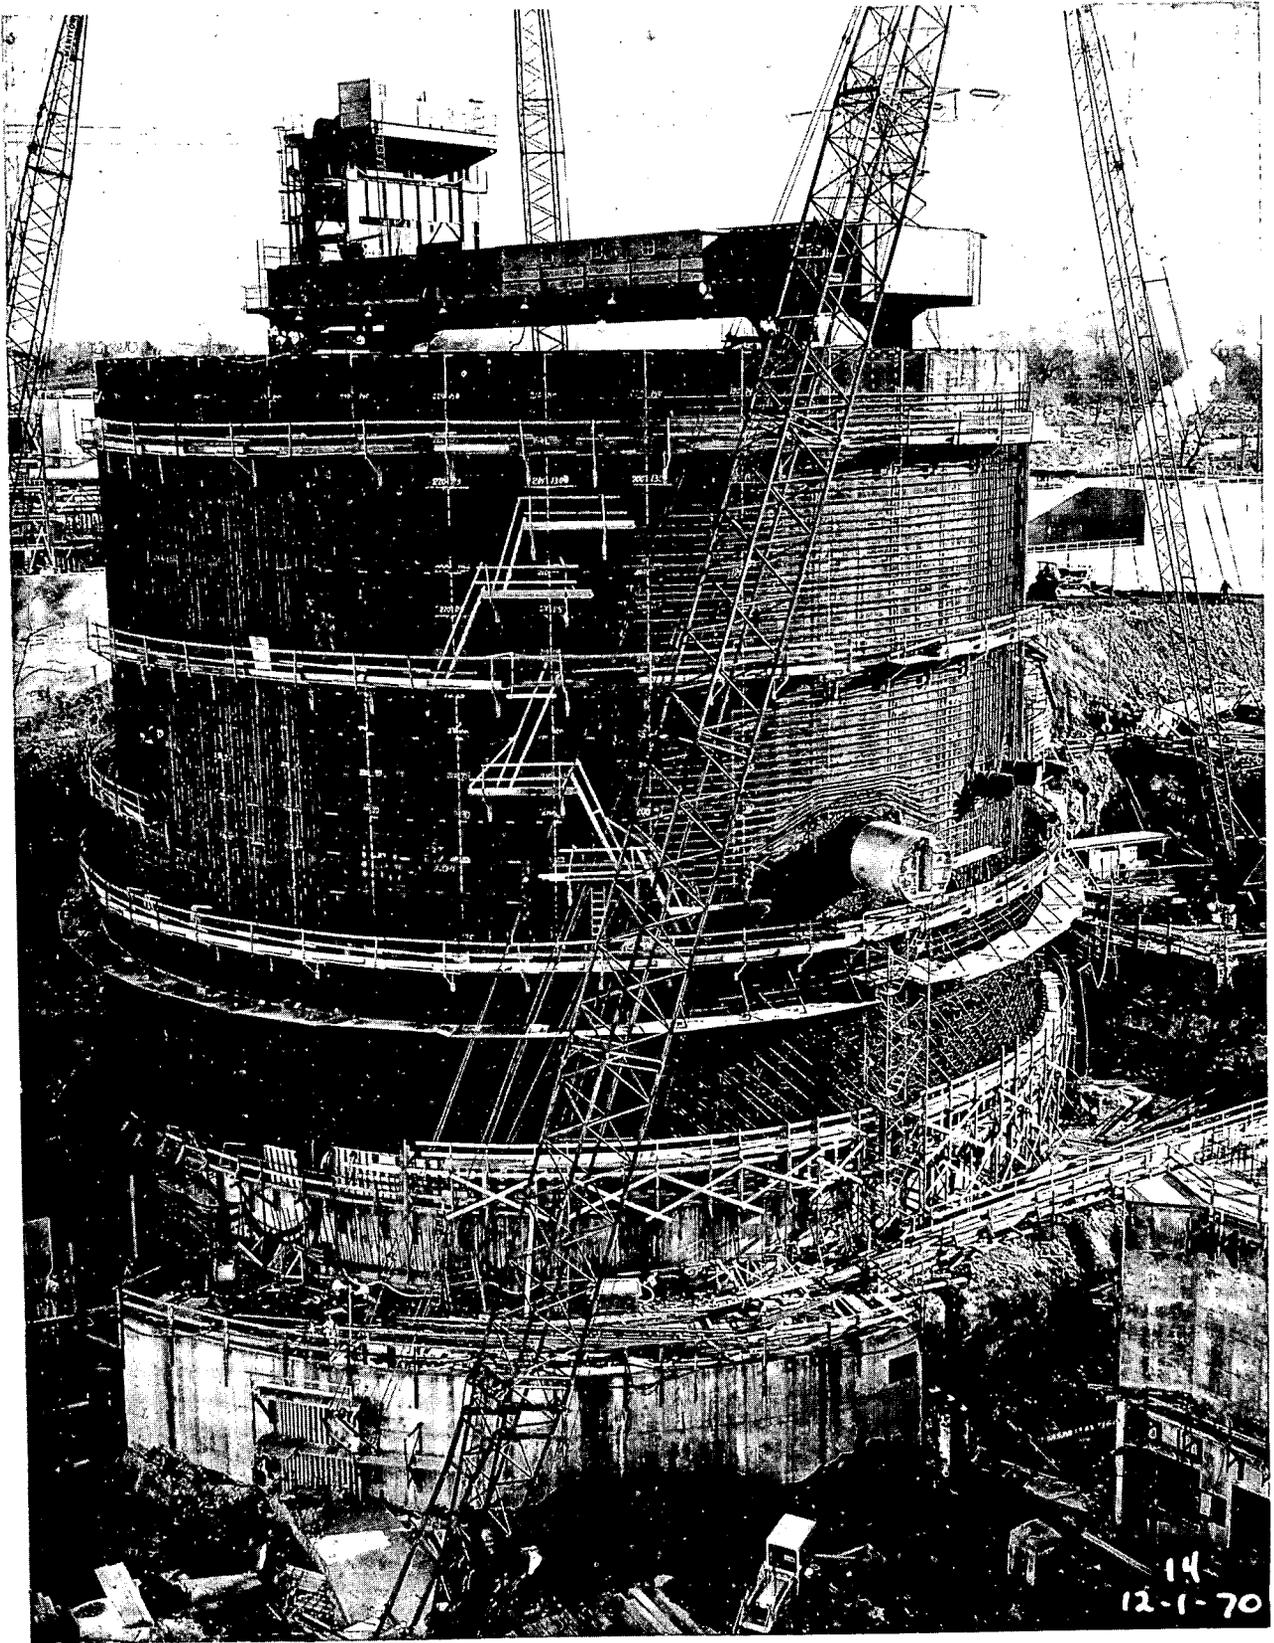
Exterior view of the Vapor Containment Building showing rebar work and the personnel lock
